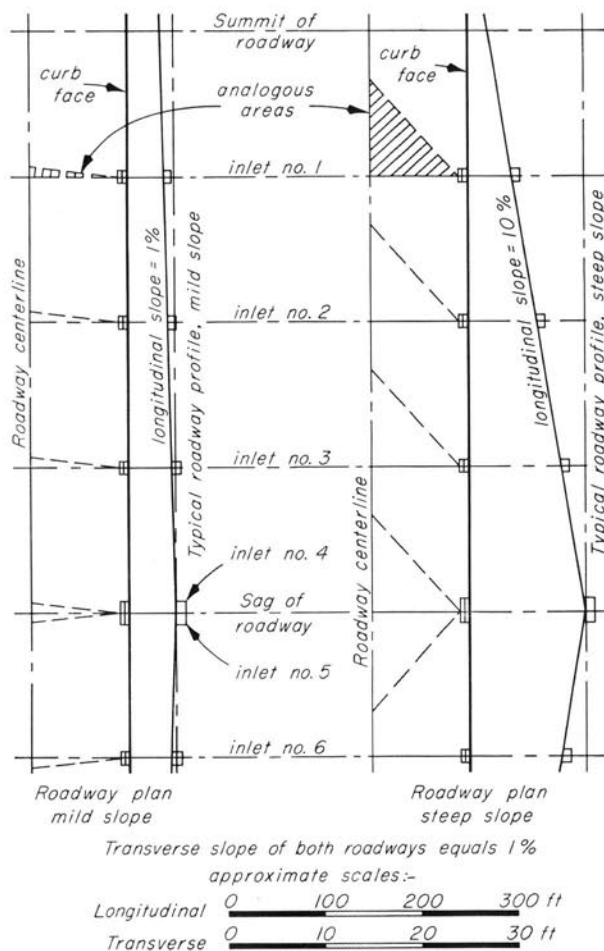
Inlet Drainage Areas for Mild and Steep Highway Slopes
